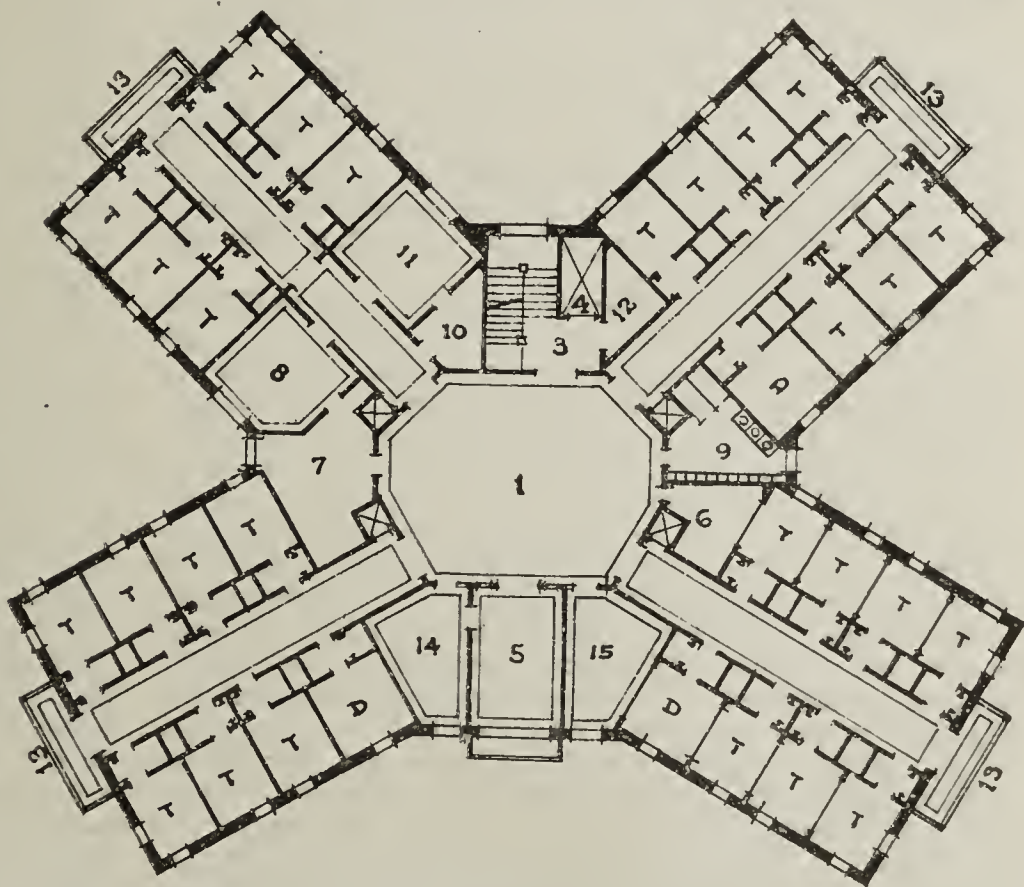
Second floor plan of eighty-five bed hospital: 1, general rotunda; 2, service dumbwaiters; 3, elevator and stair halls; 4, elevator; 5, sick babies' room; 6, milk laboratory; 7, work room; 8, nursery; 9, toilet room; 10, work room; 11, delivery room; 12, wheel chairs and carts; 13, solariums; T, typical room and utilities; D, double room and utilities; 14, bath room for babies; 15, dressing room for children.
